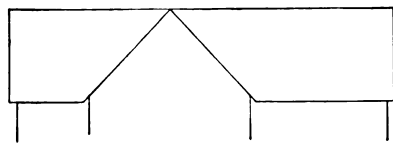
Front Elevation of Roof Shown in Fig. 26.
